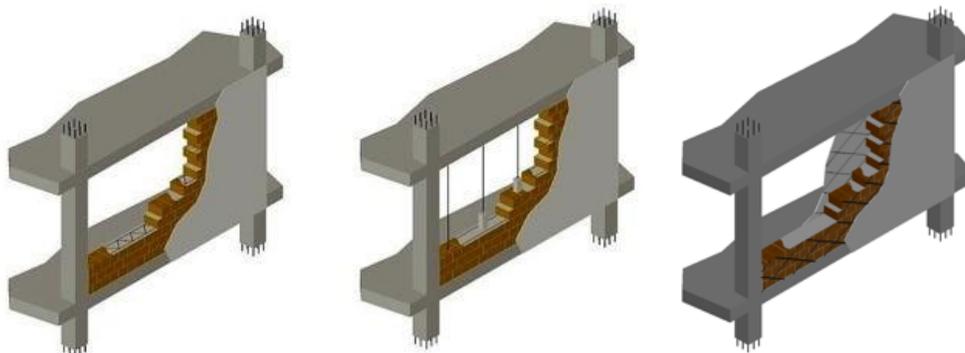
Solutions: horizontal reinforcement; horizontal and vertical reinforcement; new types of plastered wire meshes (from left to right)
